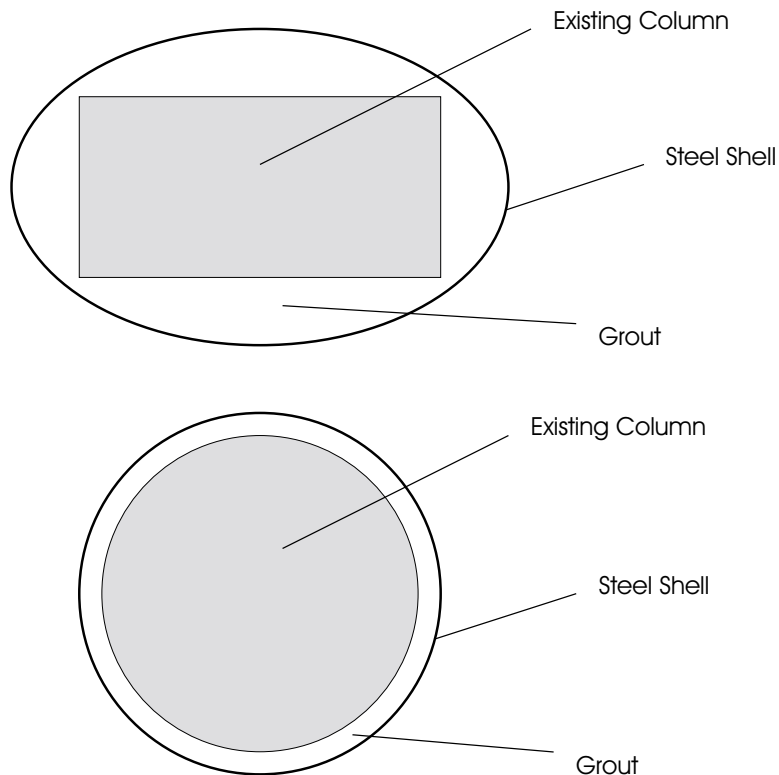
Cross-sections through steel shell retrofits as applied to round and rectangular columns (not to scale). Diagram by the author.
